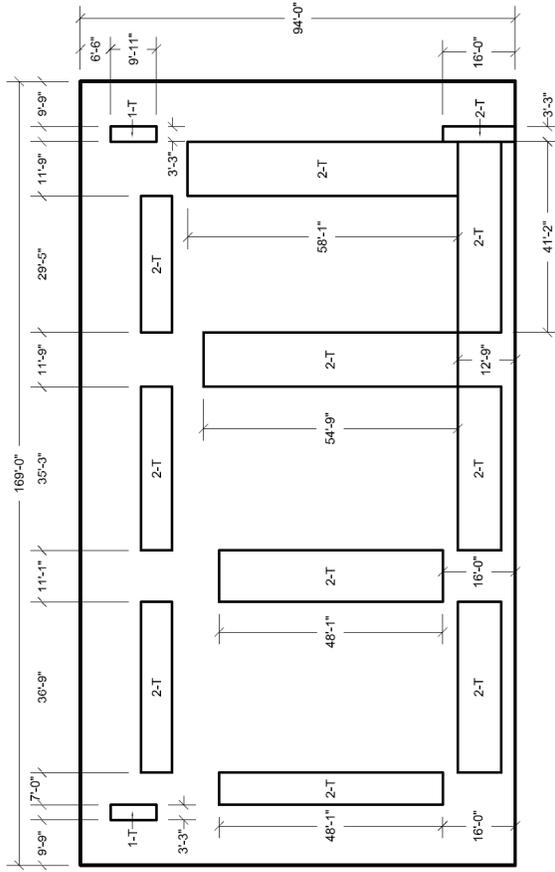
H.6-126A: PUMP HOUSE FOUNDATION MAT
